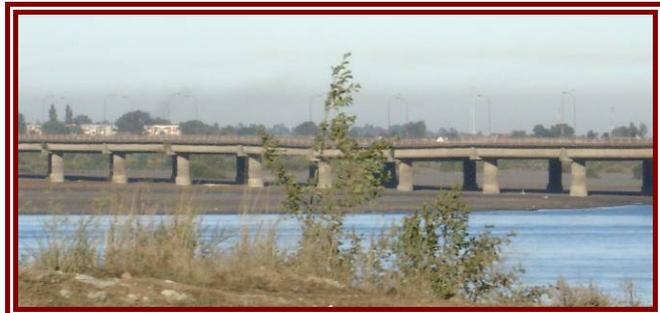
Signs of pier settlement on the Juan Pablo II bridge
